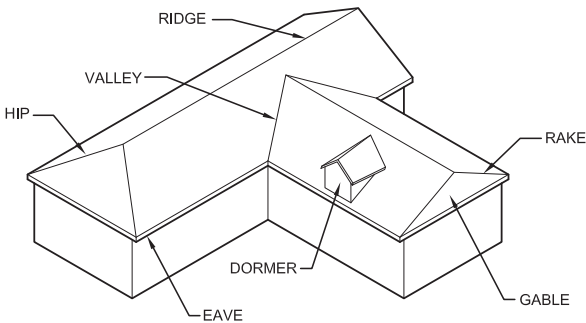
Examples of steep-slope roof deck styles and components of a roof system
